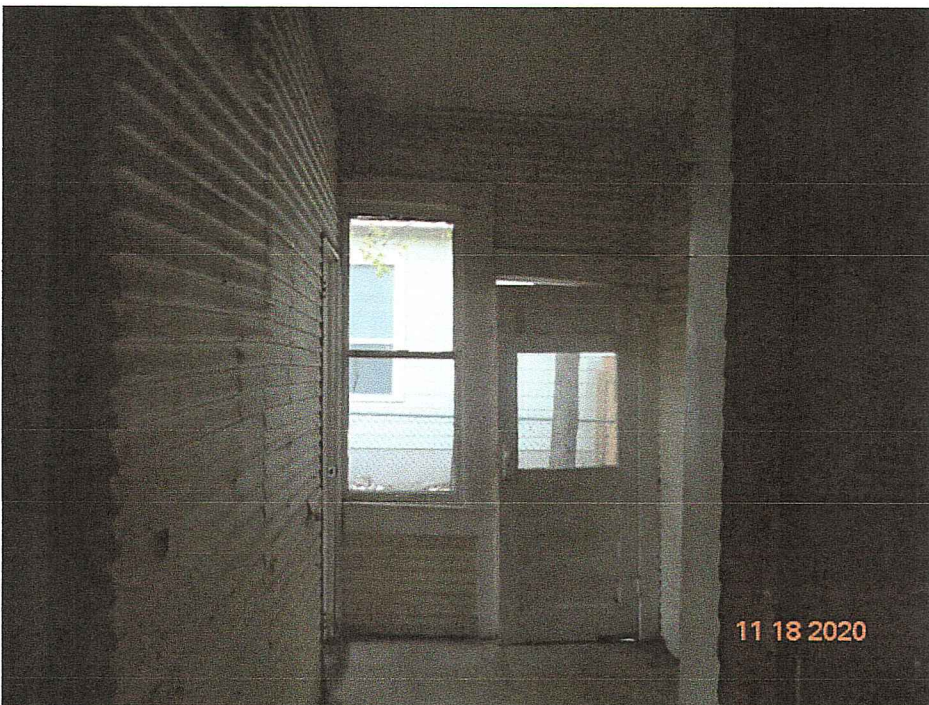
anotehr view like photographs No. 05 and 06 at wall framing at two siding patterns interface
